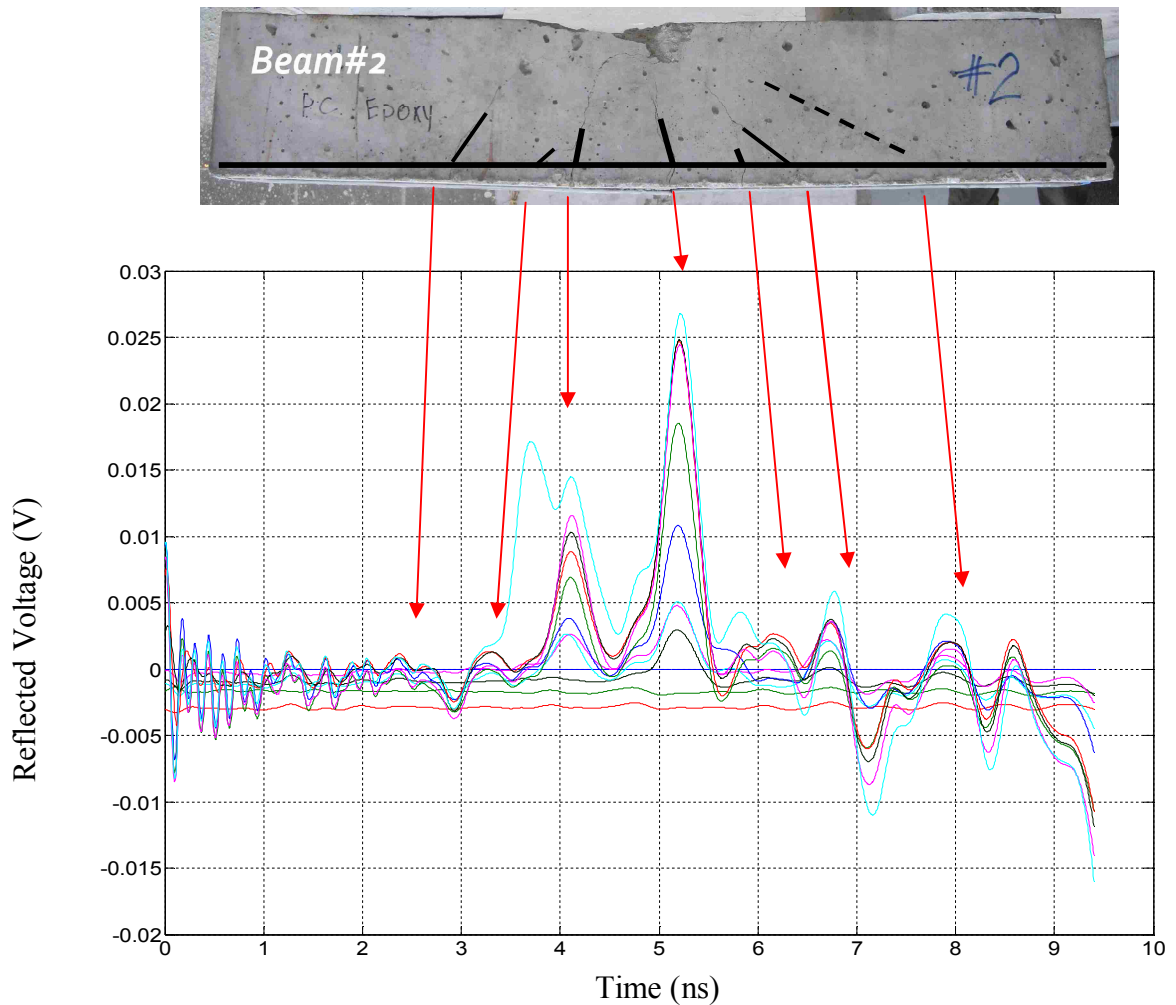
Crack pattern of Beam # 2 and TDR signatures from Sensor # 1: embedded with Portland cement
